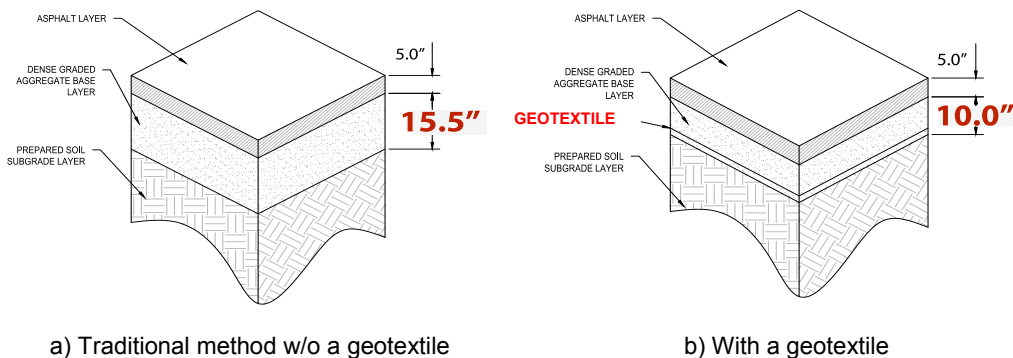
The differences in road cross sections w/o and with a separation/ stabilization geotextile
